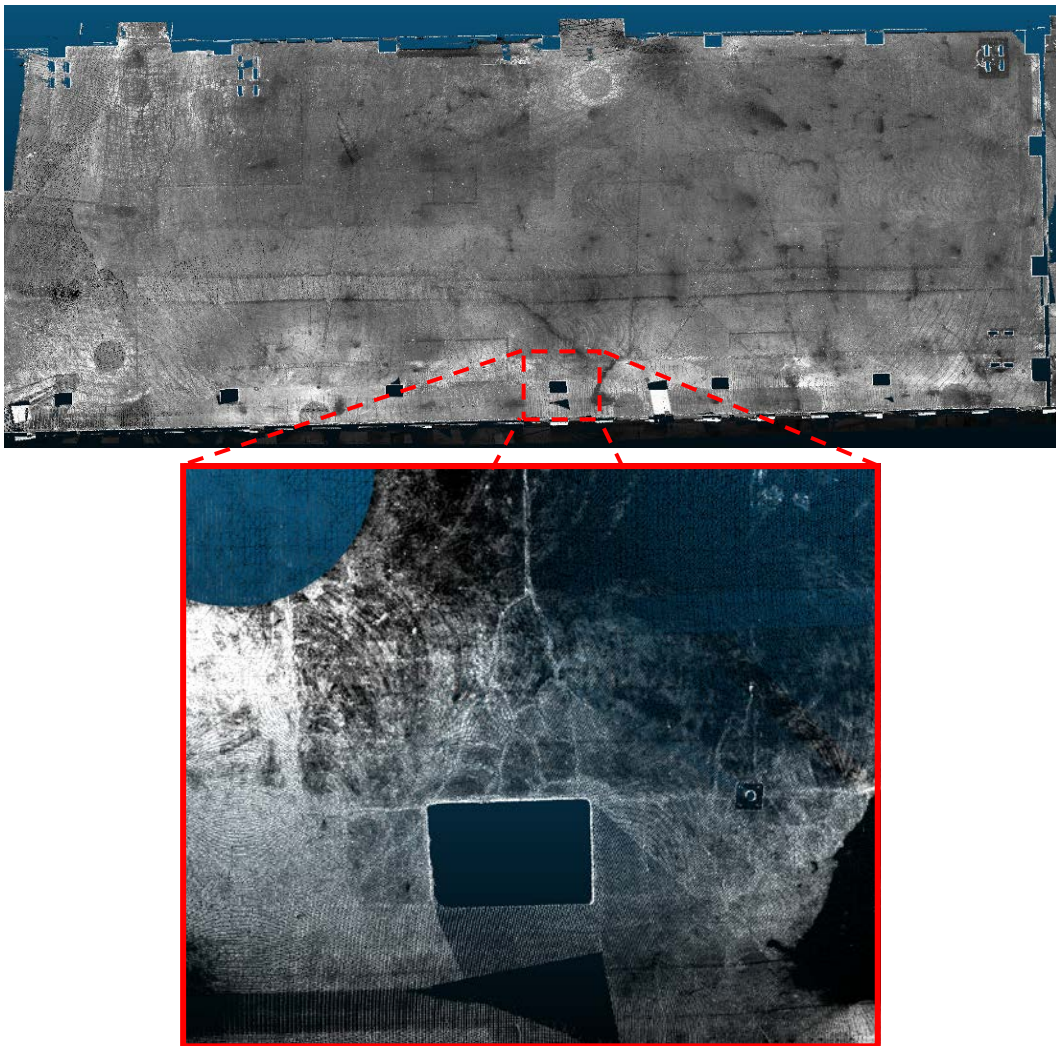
Example of floor cracking detected by TLS- Pier3-Floor2
